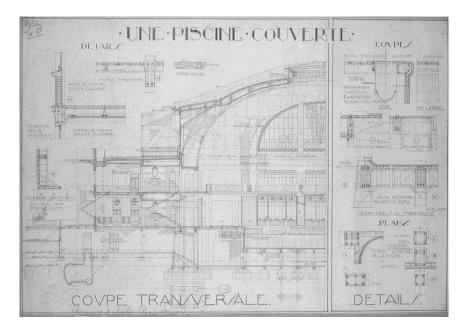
Heitzler, "concours de construction générale" 1921: a covered swimming pool. Cross section and details (BENSBA, CG 357)
